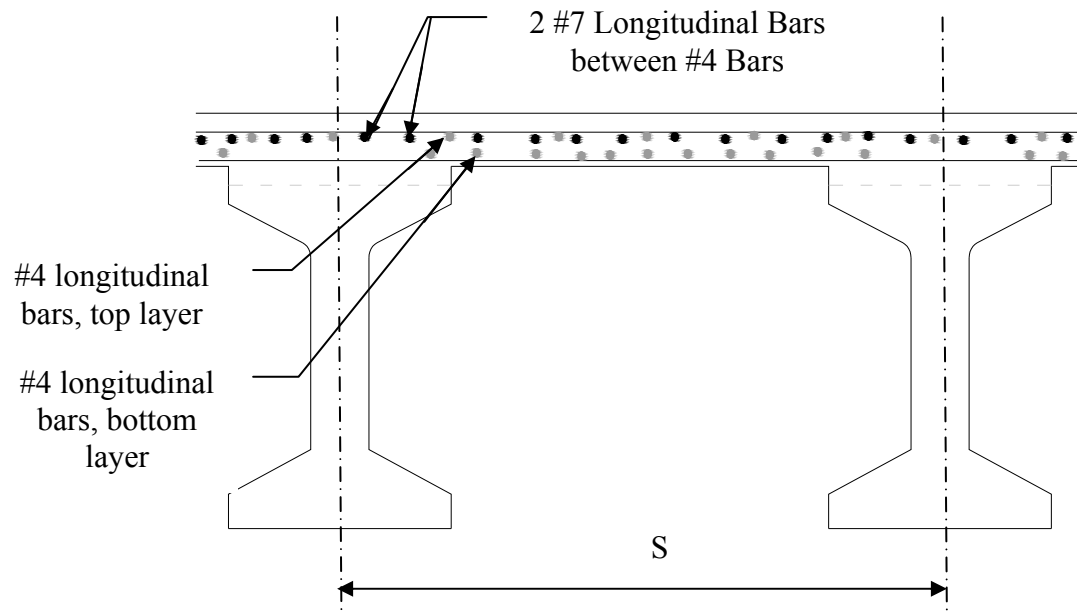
Section view through an intermediate bent at a construction joint with reinforcement layout circa 1987 (modified from GDOT SR 46 Over Oconee R. plan)
